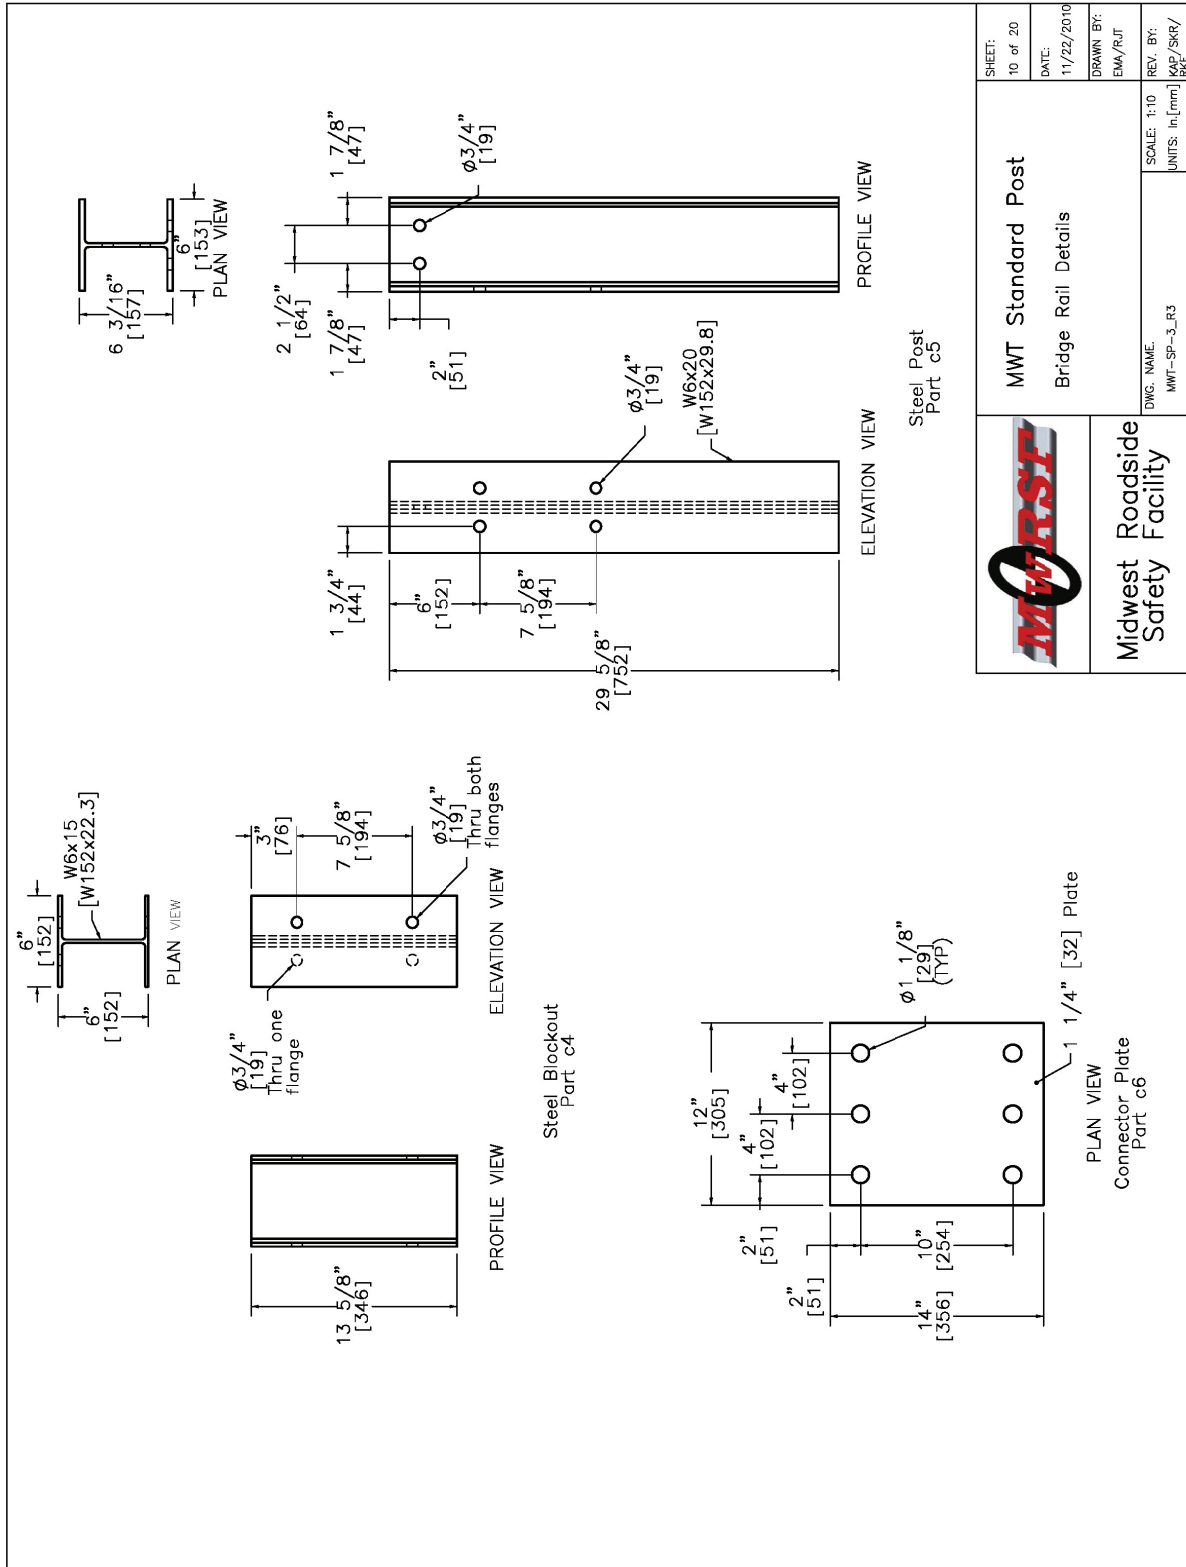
Bridge Rail Component Details, Test Nos. MWTSP-1 through 3
